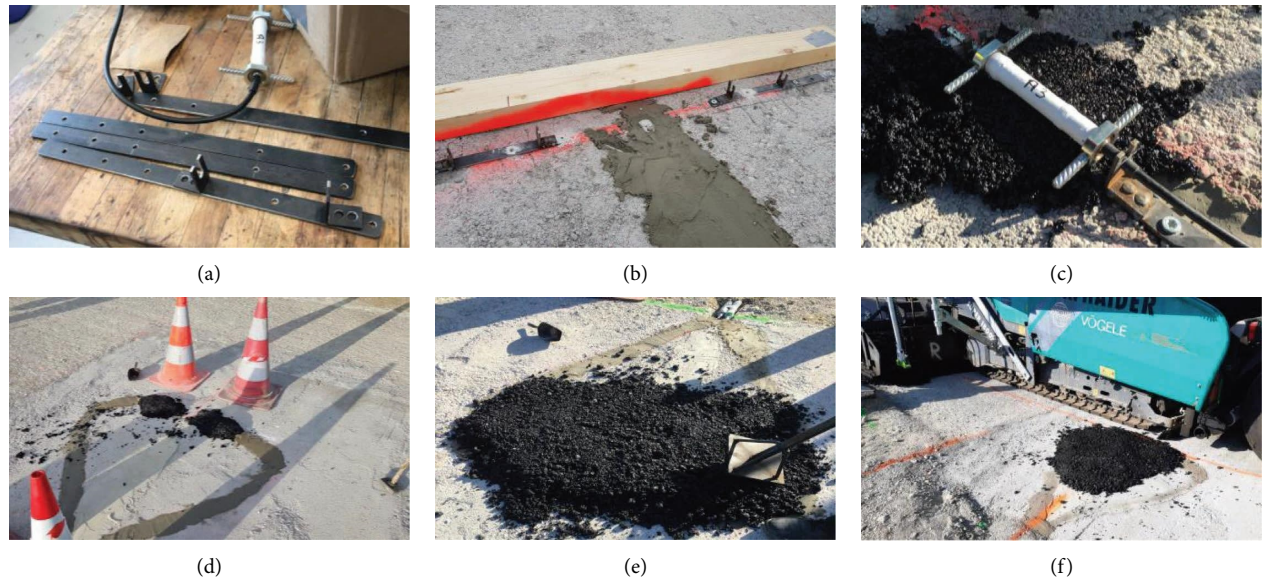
Installation of asphalt strain gauges at field-testing site #2 on the A3 using method B: installation in a fixation tool, before asphalt placement.
